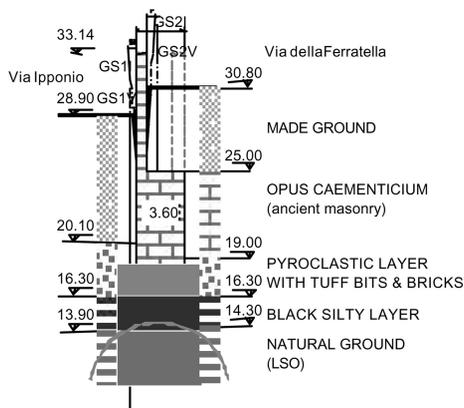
Schematic section through the Aurelian Wall at Largo Amba Aradam.
